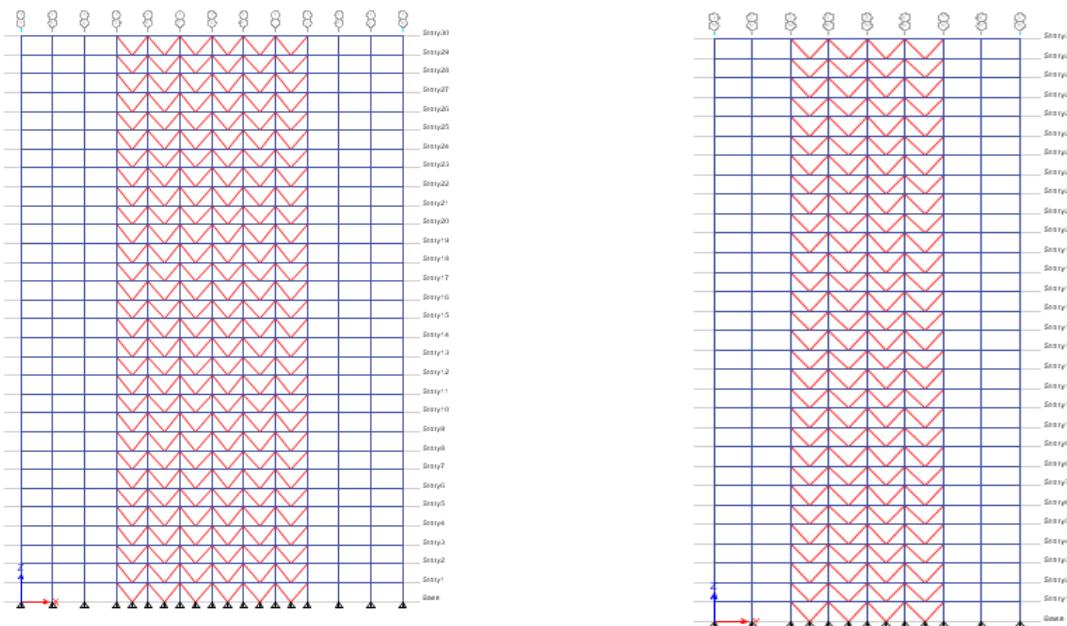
Elevation of tube in tube structure with V bracing in X and Y direction
